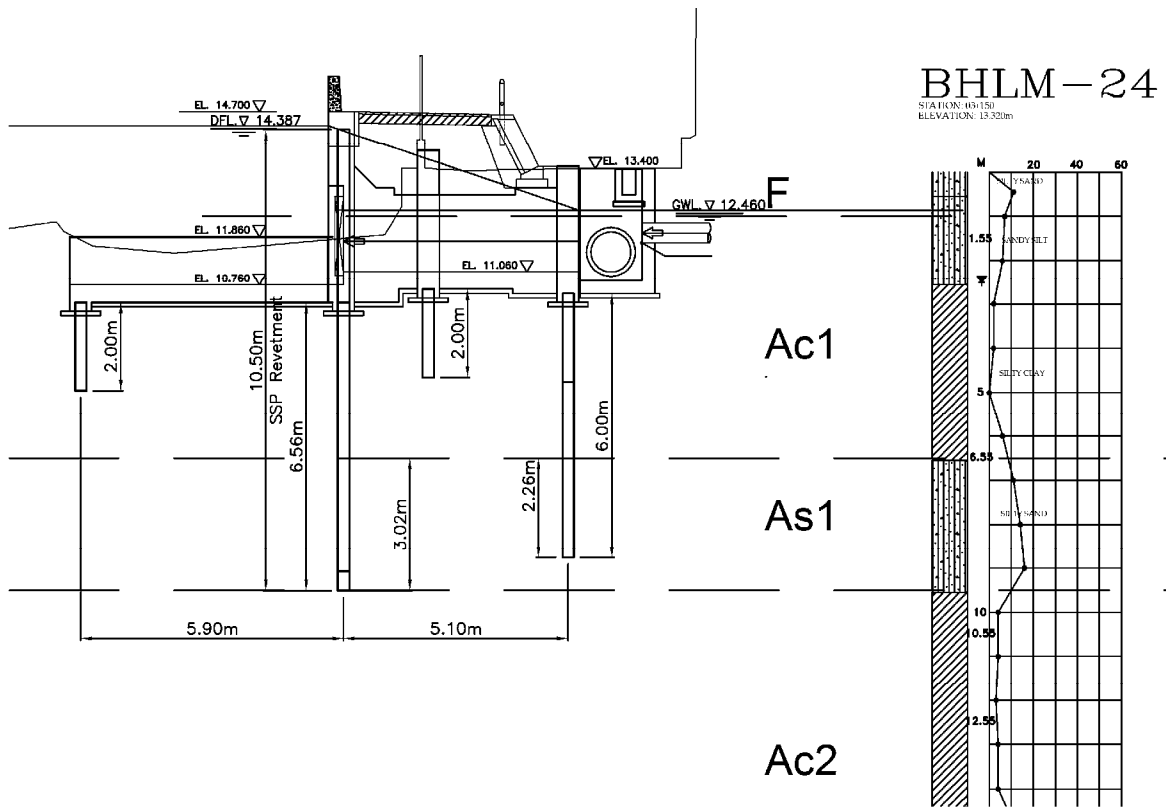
Length of SSP Cut off Wall (7/9) (MSR-2)
